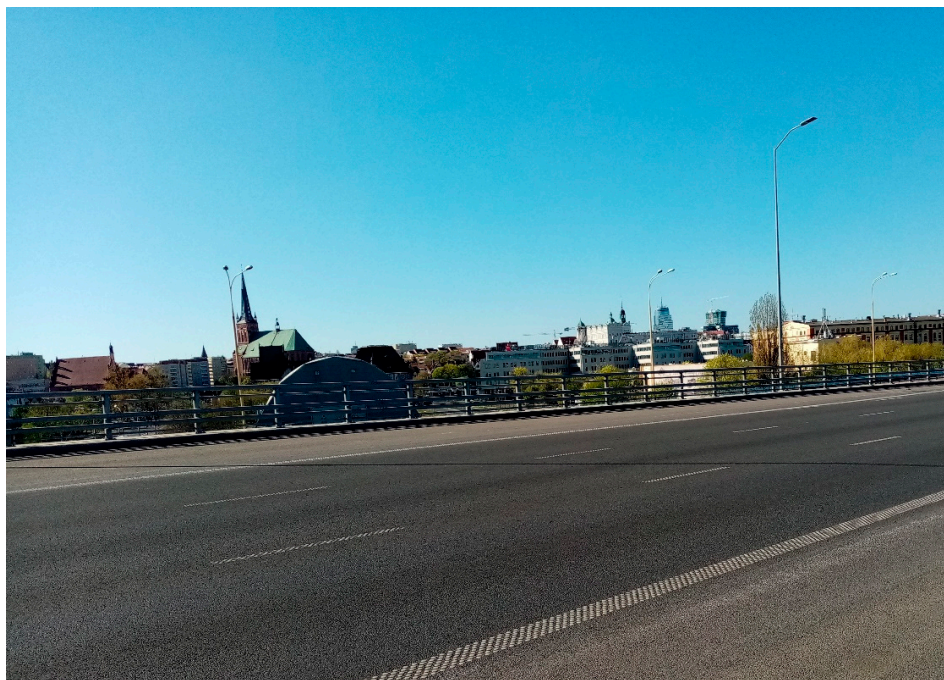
Bridge pavement with the protective layer made of SMA-MA 8 mixture two years after renewal.
